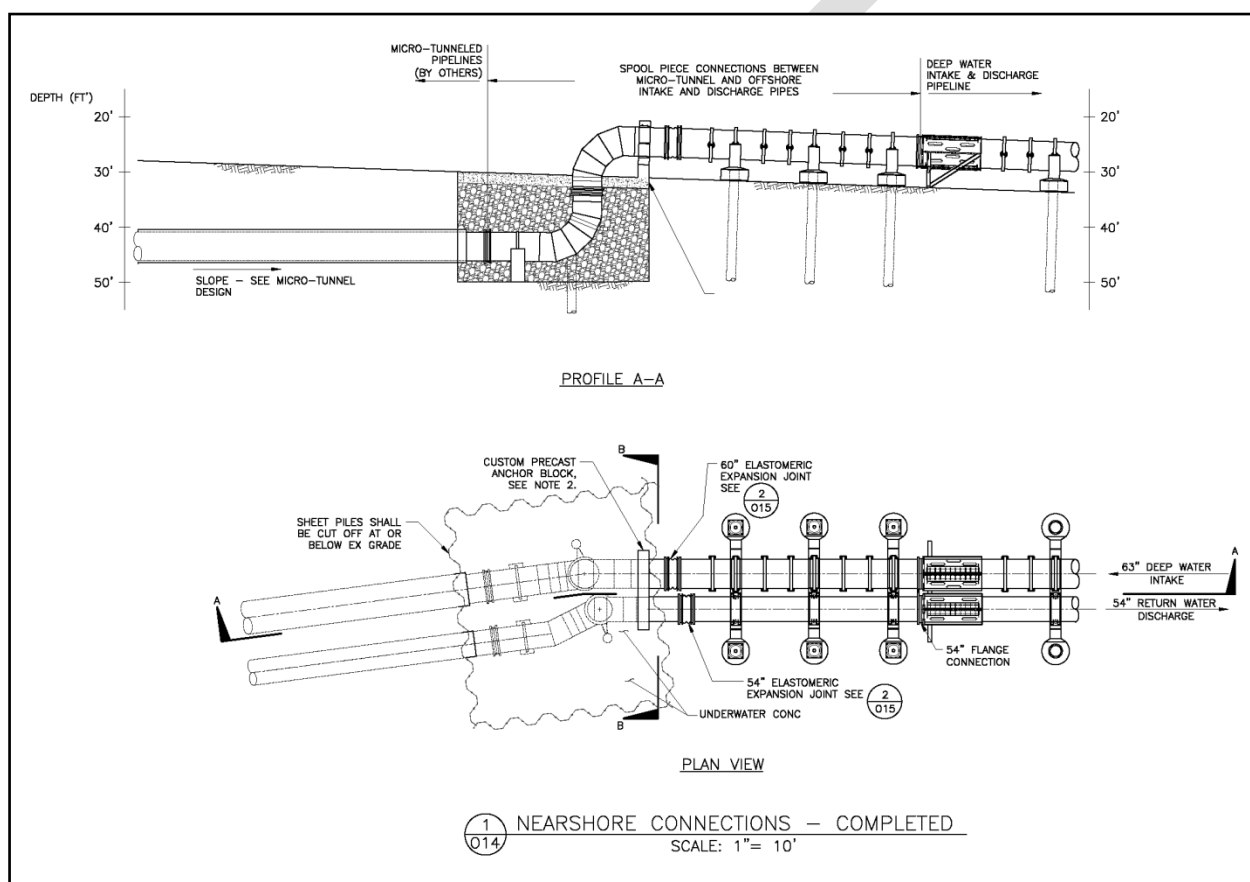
Details of Receiving Pit and Connection Between Microtunneled and Intake and Return Seawater Pipes
